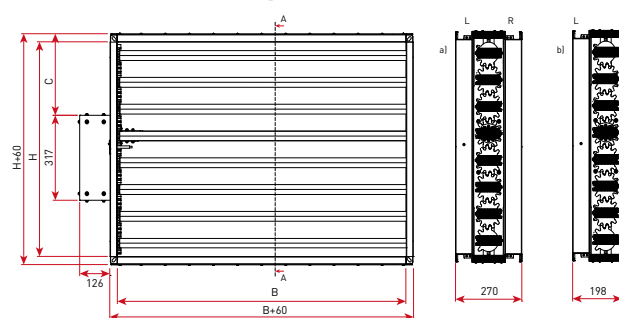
Dimensions of dampers WKP-O: a) WKP-O-K b) WKP-O-KL (with one connection frame by L side).
